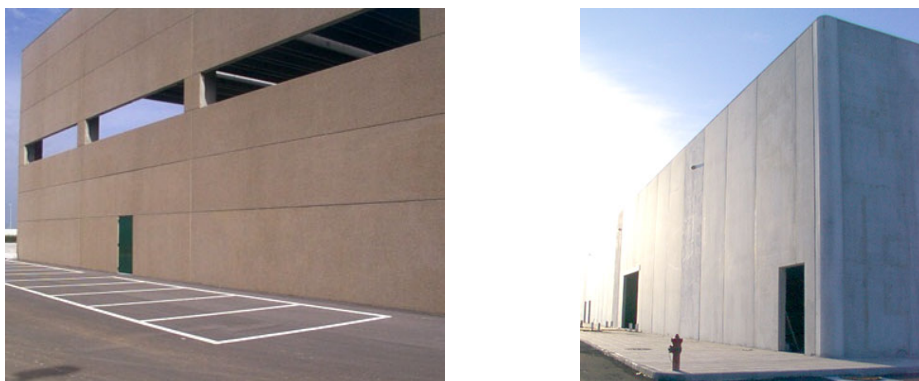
Cladding panels: (a) horizontal and (b) vertical layout
